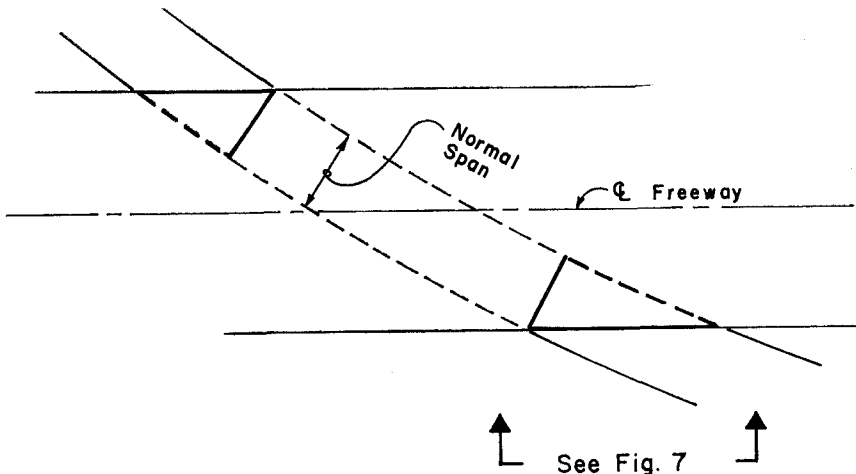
Plan of Mac Arthur Boulevard Undercrossing.
